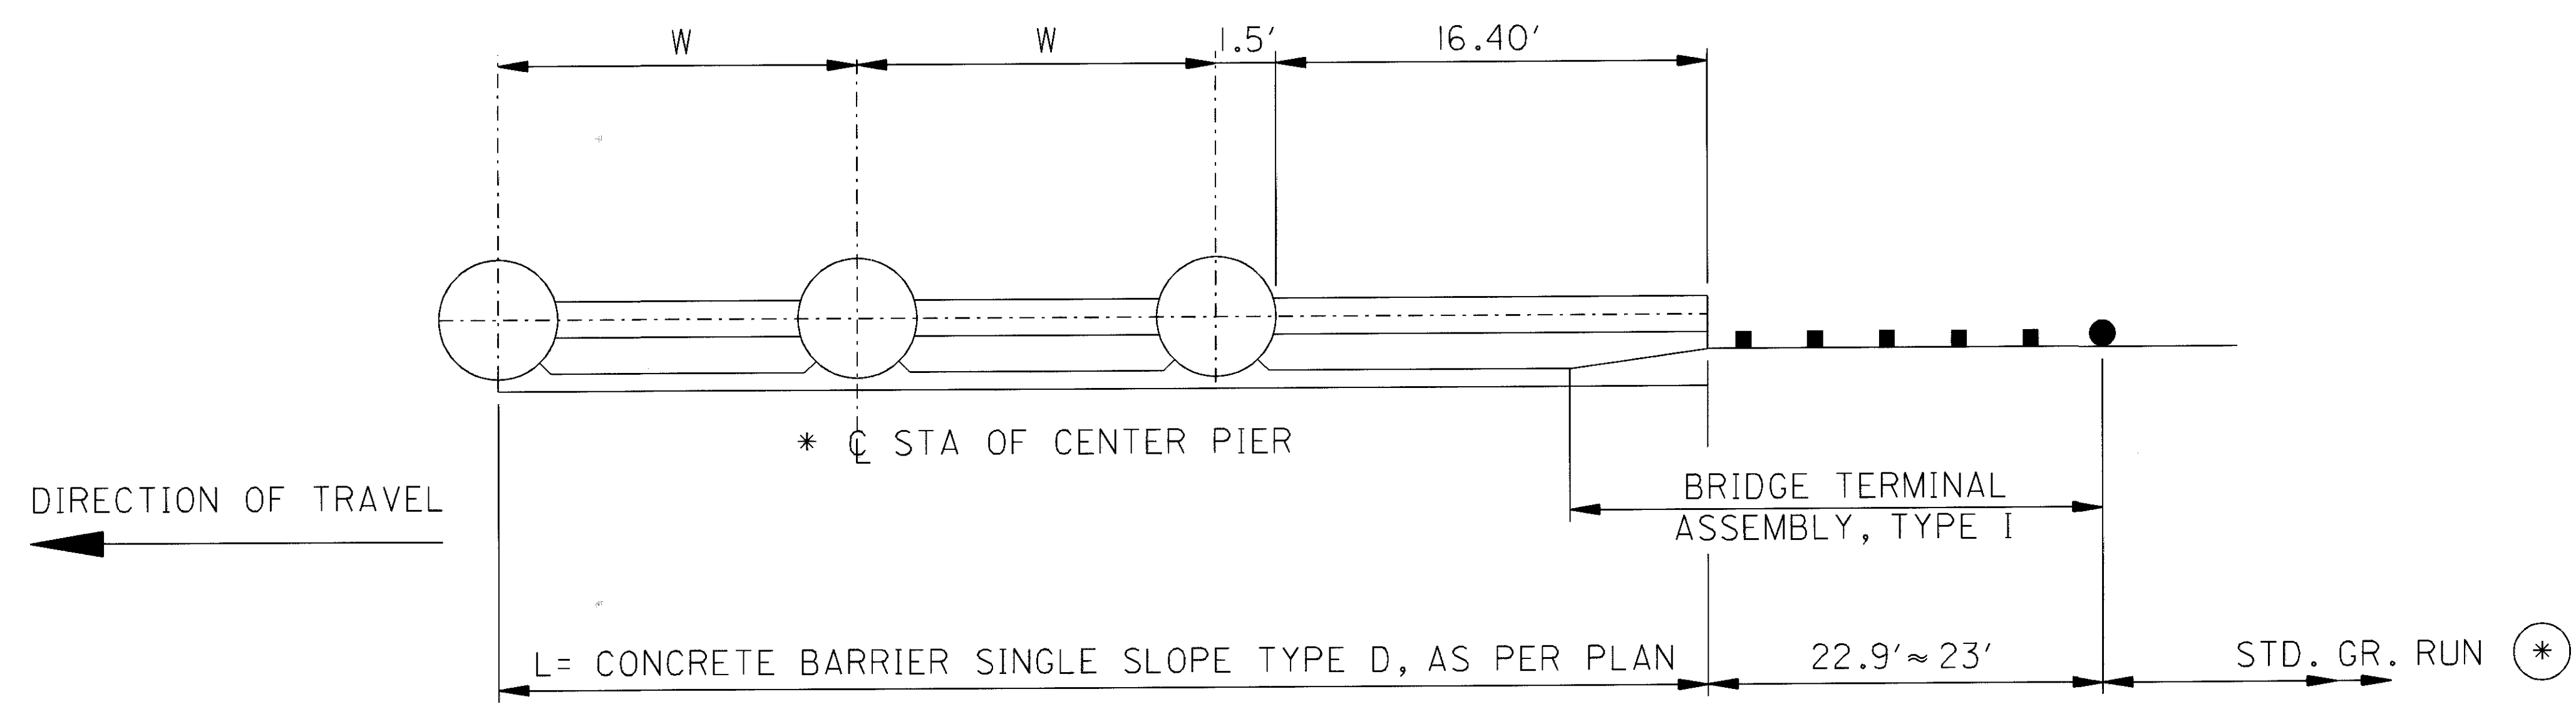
DETAIL FOR MEDIAN GUARDRAIL AT BRIDGES
